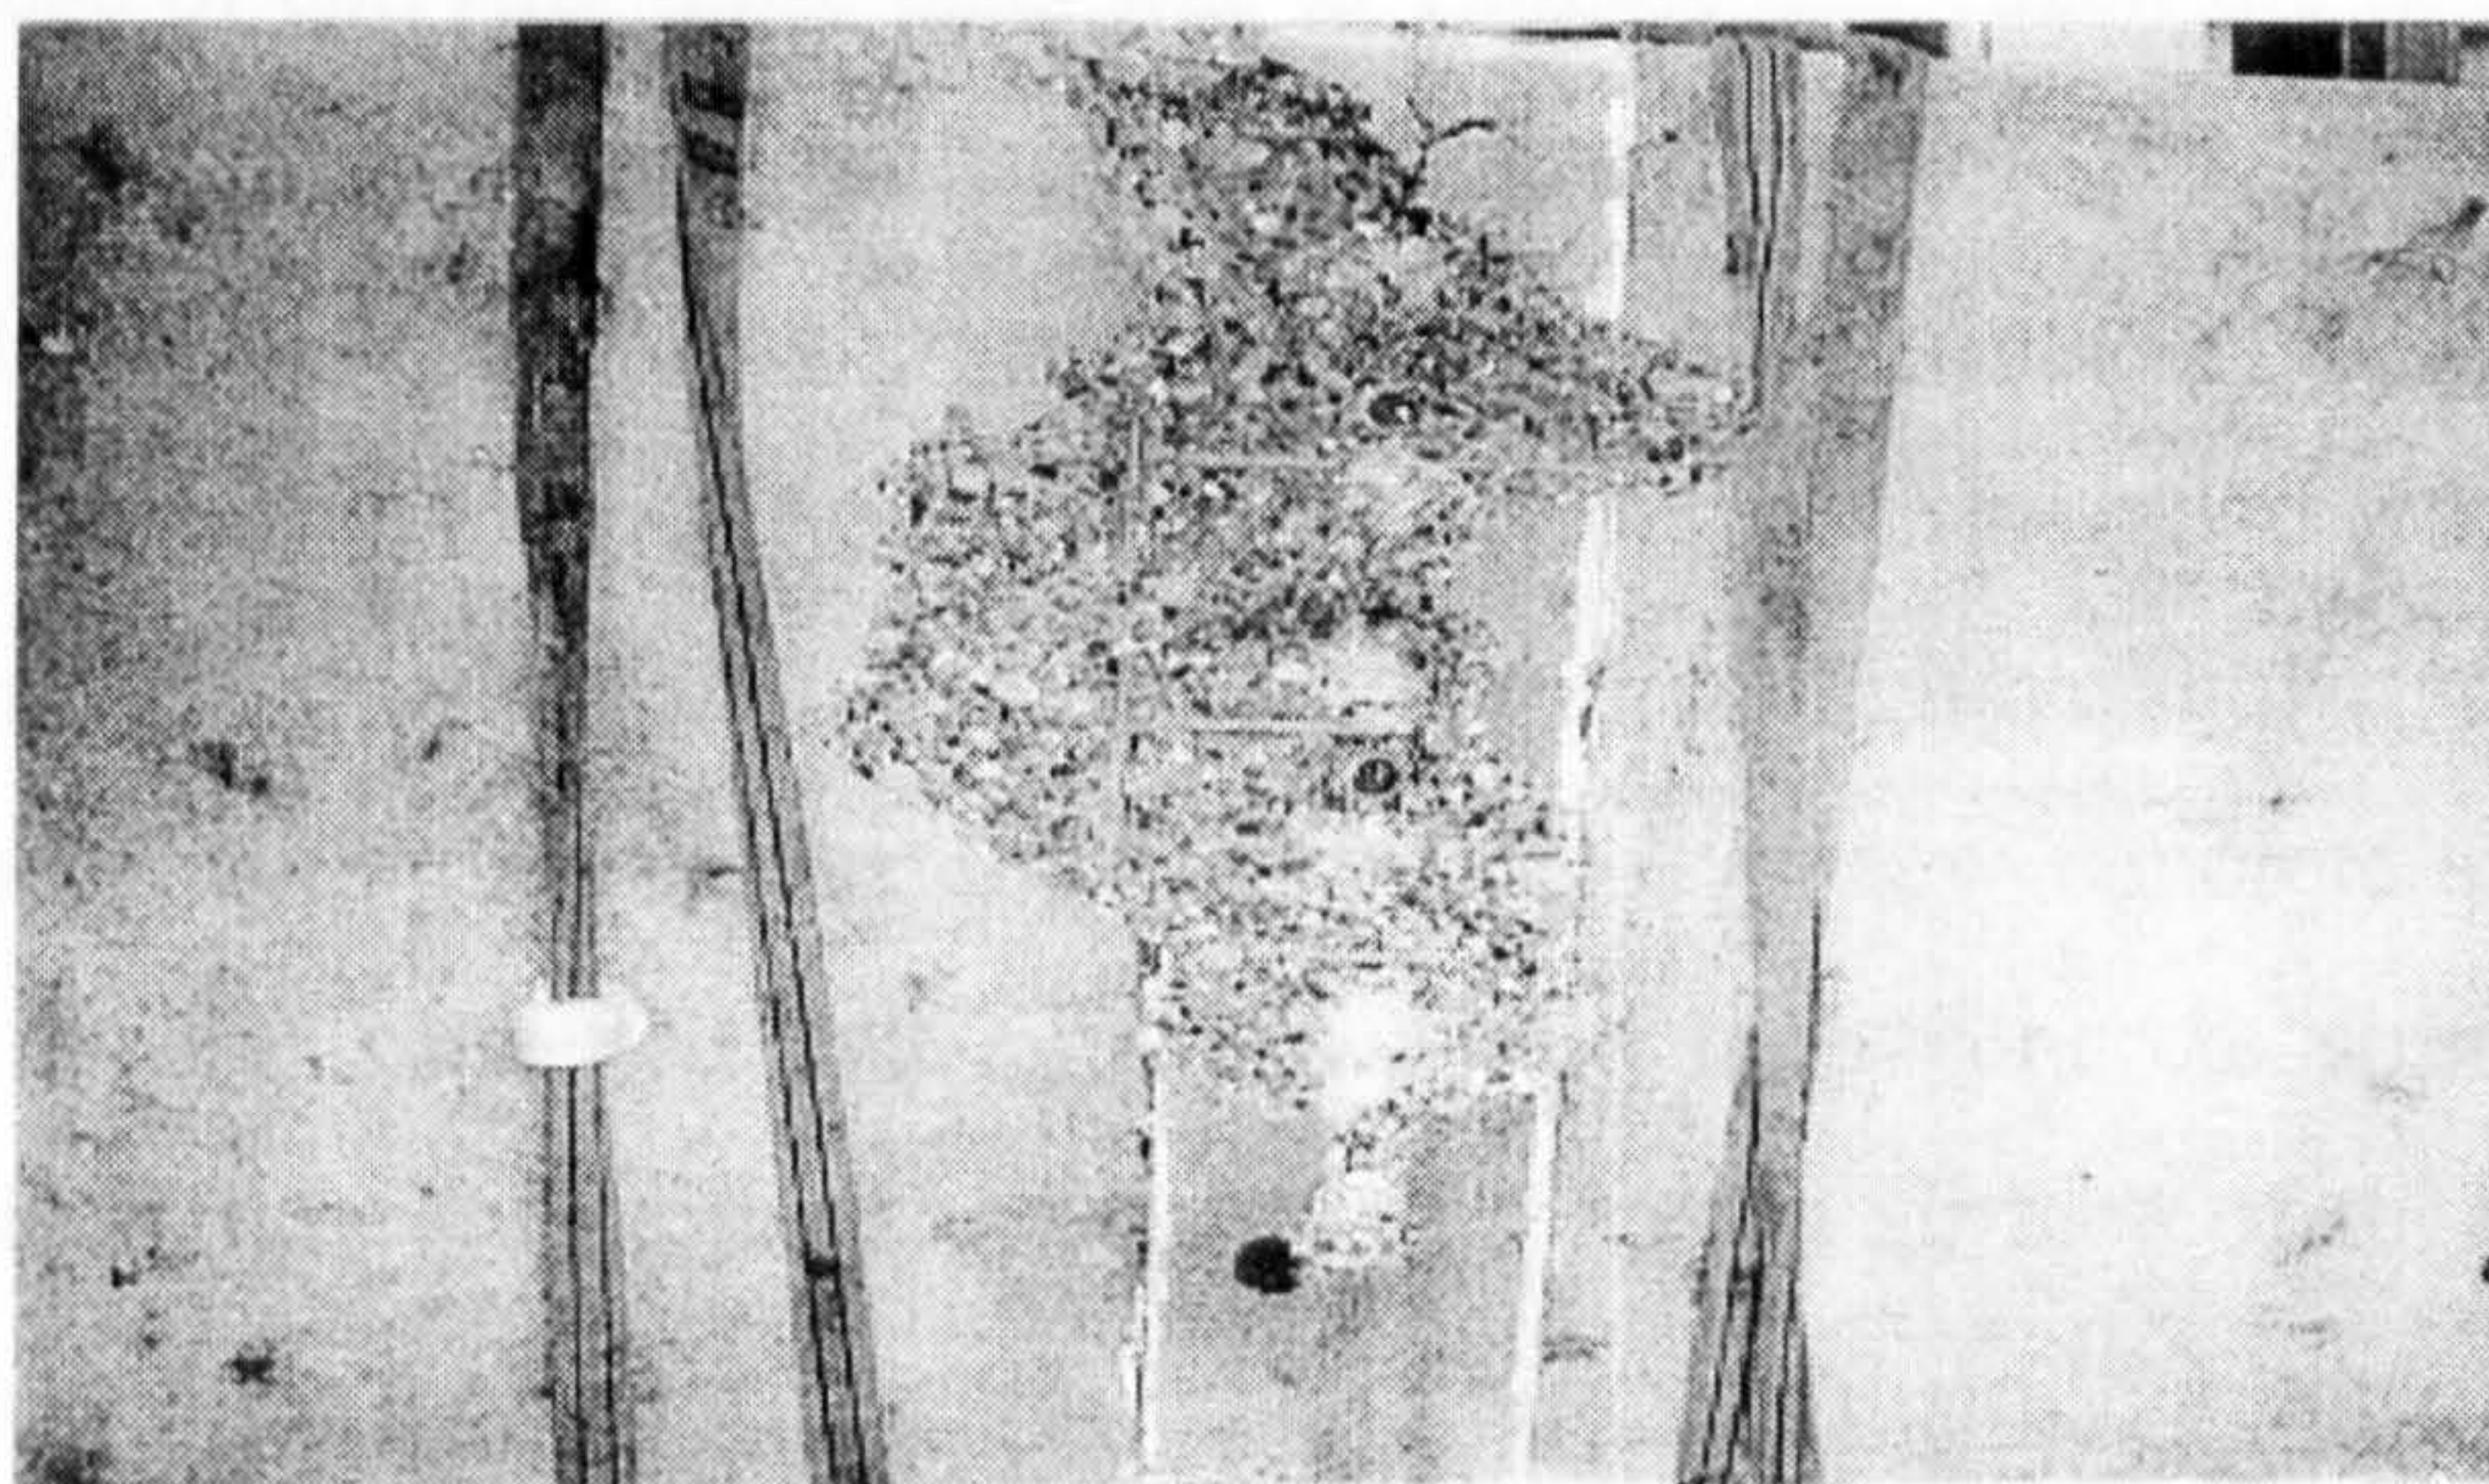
Distortion of lower surface of concrete slab of test specimen S4
